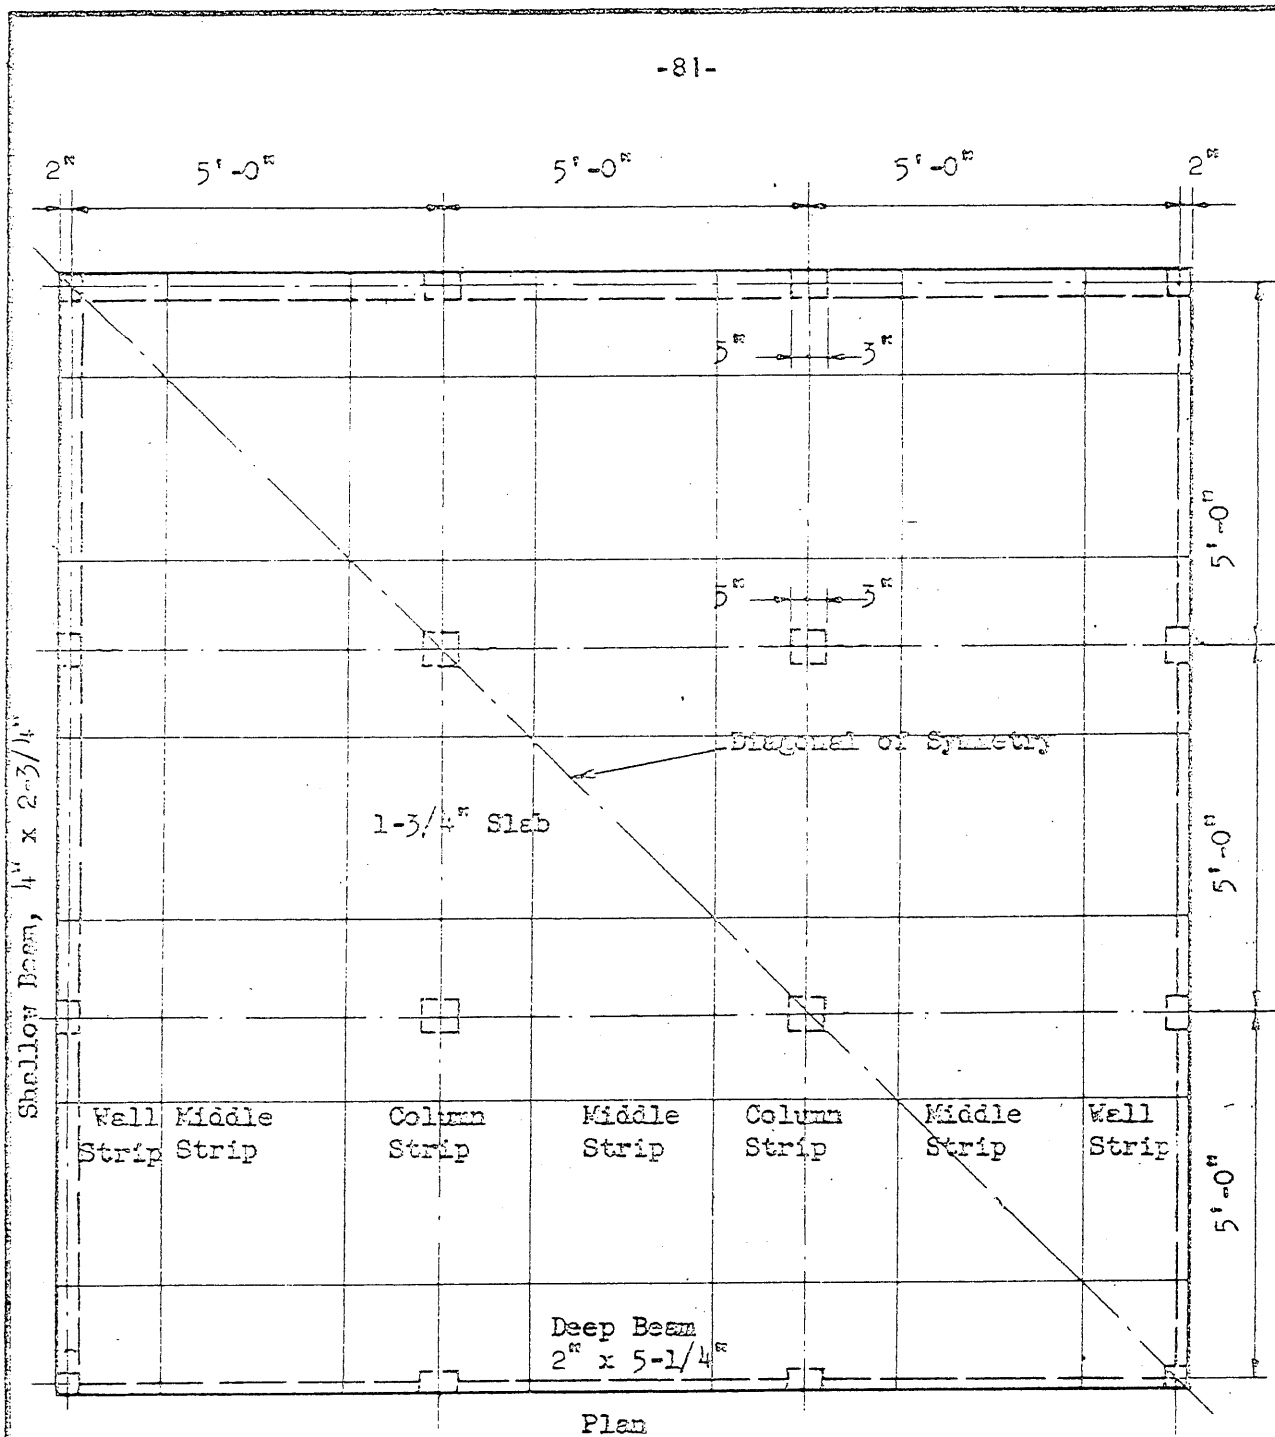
LAYOUT OF FLAT PLATE TEST STRUCTURE (F1)
